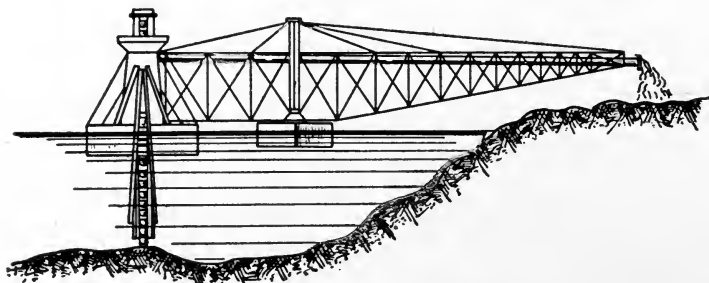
Ladder Dredge with Pipe Conveyor.
